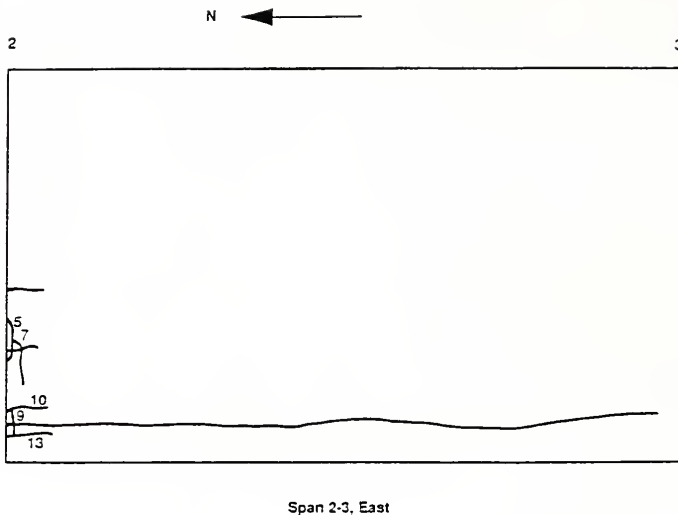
Crack Patterns, Bridge # 7-40-6527
